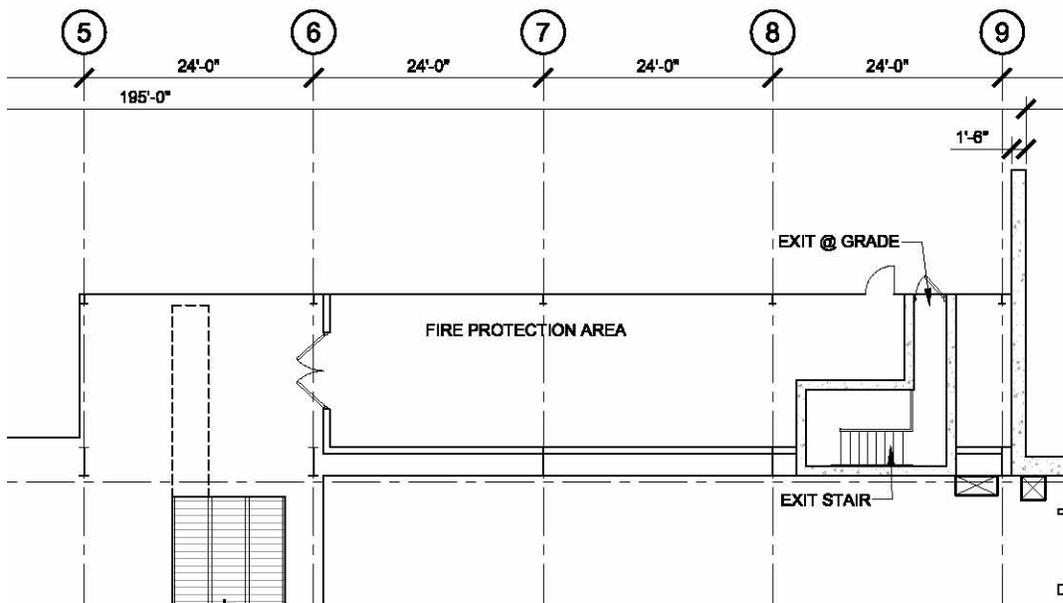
Plan at Service Building indicating location of the Fire Protection Area.
